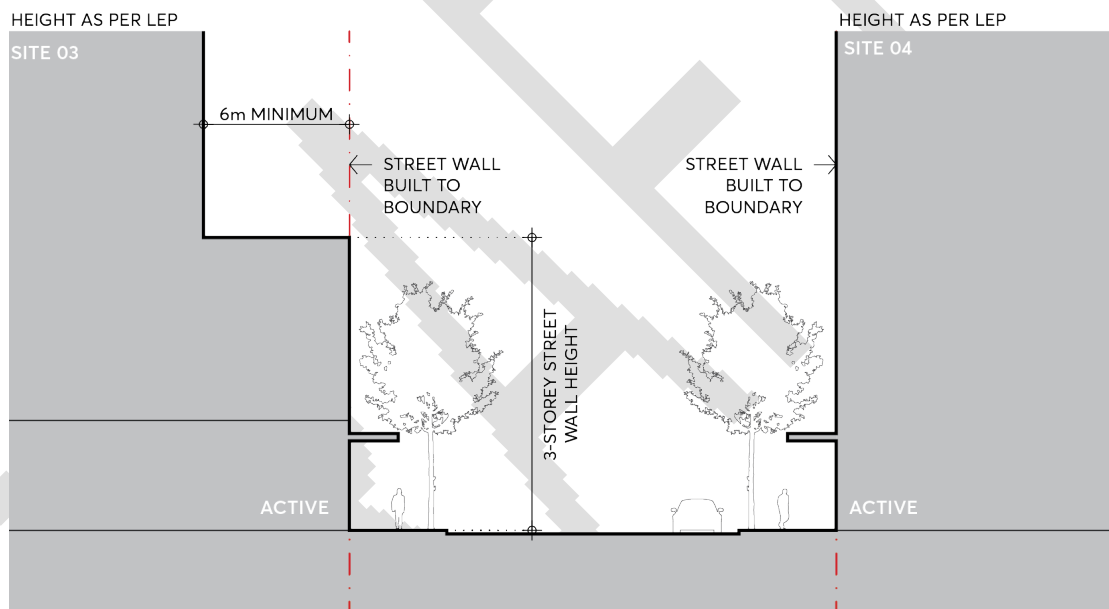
Marion Street (Section A) Setbacks and Street Wall Height
